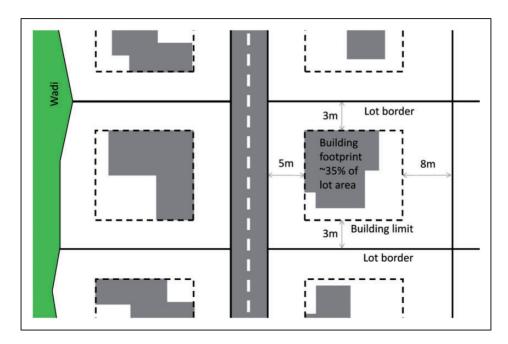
A typical parcel plan with the Building Limit Frontier marked.
